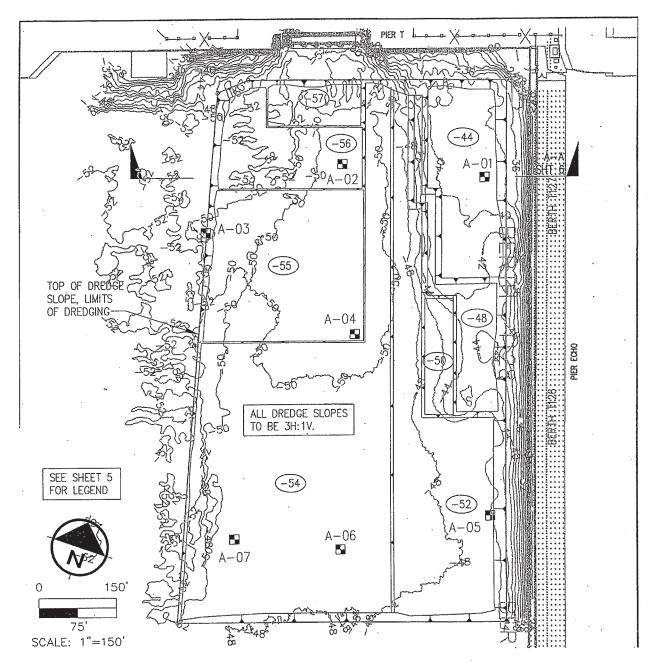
Dredging plan for AOEC-A for IR Site 7.
